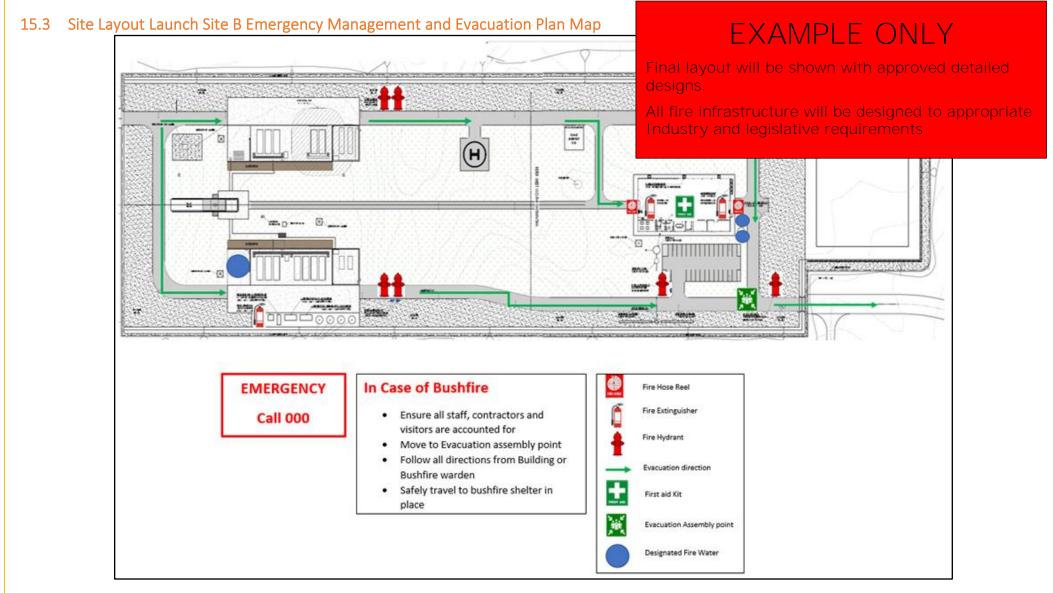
Launch Site B Emergency Management and Evacuation Plan
